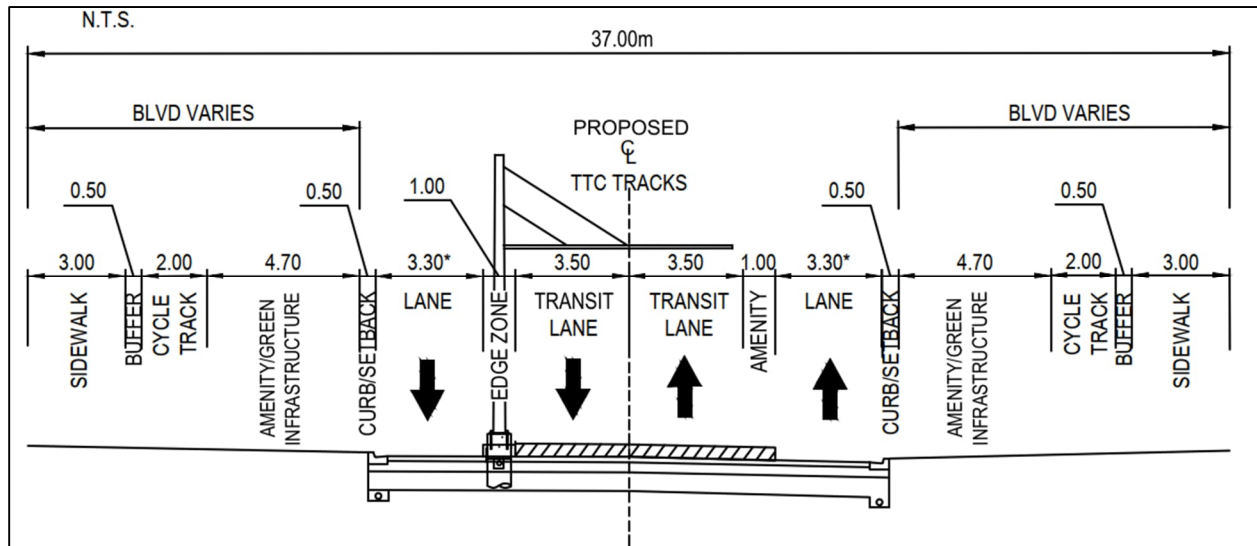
Lake Shore Boulevard West Improvements, West Leg at Shore Breeze Drive – Typical Concept Cross-section
